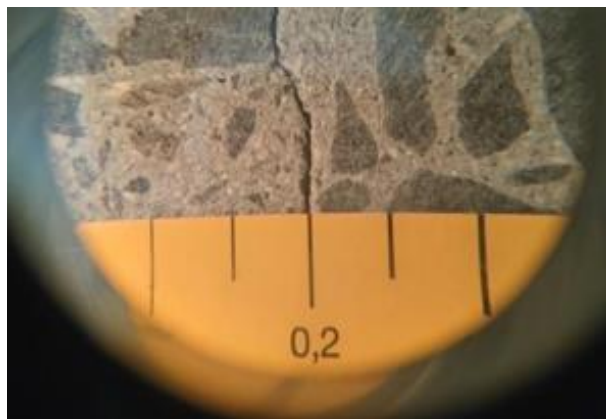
Crack width measurement using crack meter (Sohawon, 2018)
